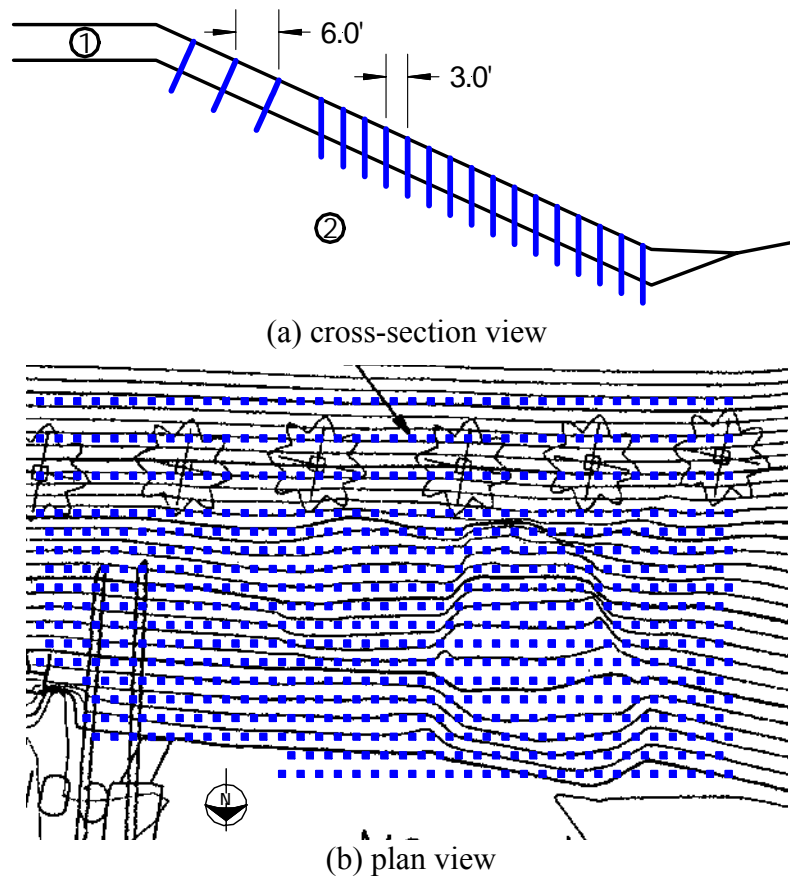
Selected stabilization scheme for the I435-Wornall Road site: (a) cross-section and (b) plan view superimposed on elevation contours of the site established following the most recent slide.
